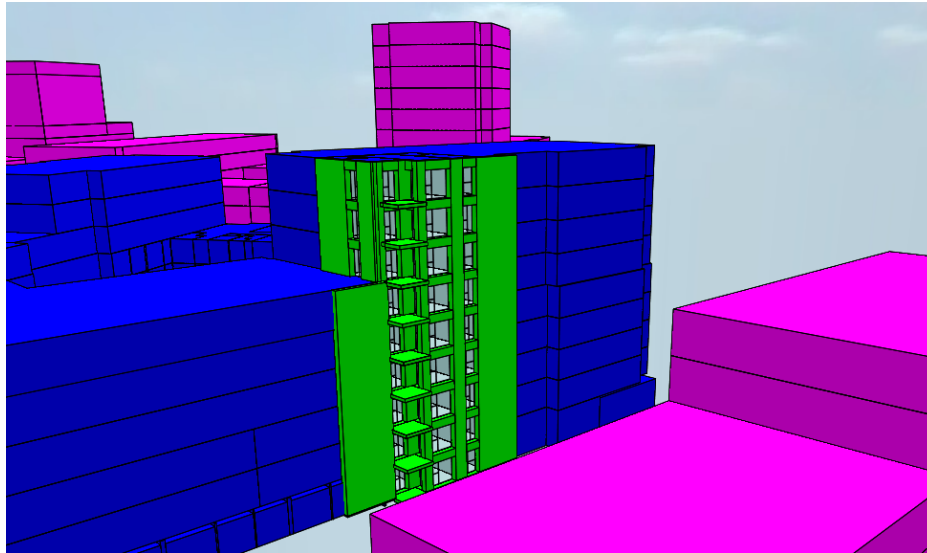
Block 05a Model Image - Sample Strip on Northwest Facade
